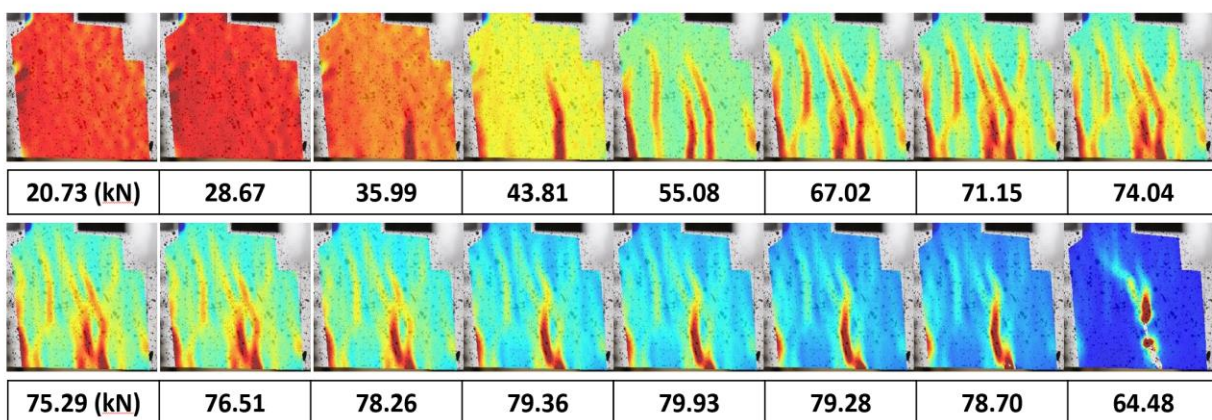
Crack development in flexural specimen (P6, Batch 1)
